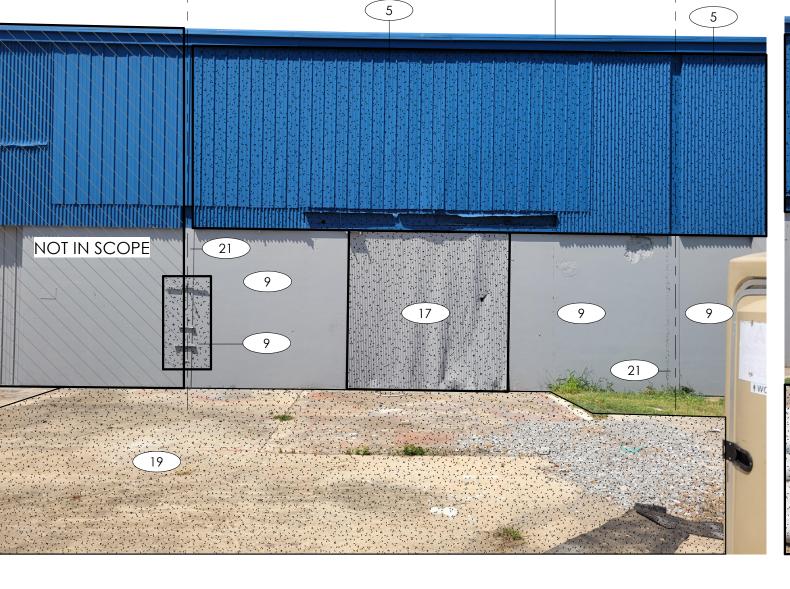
SOUTH ELEVATION - BAY 15 & 16 EXISTING CAMERA TO -REMAIN, REMOVE AND
